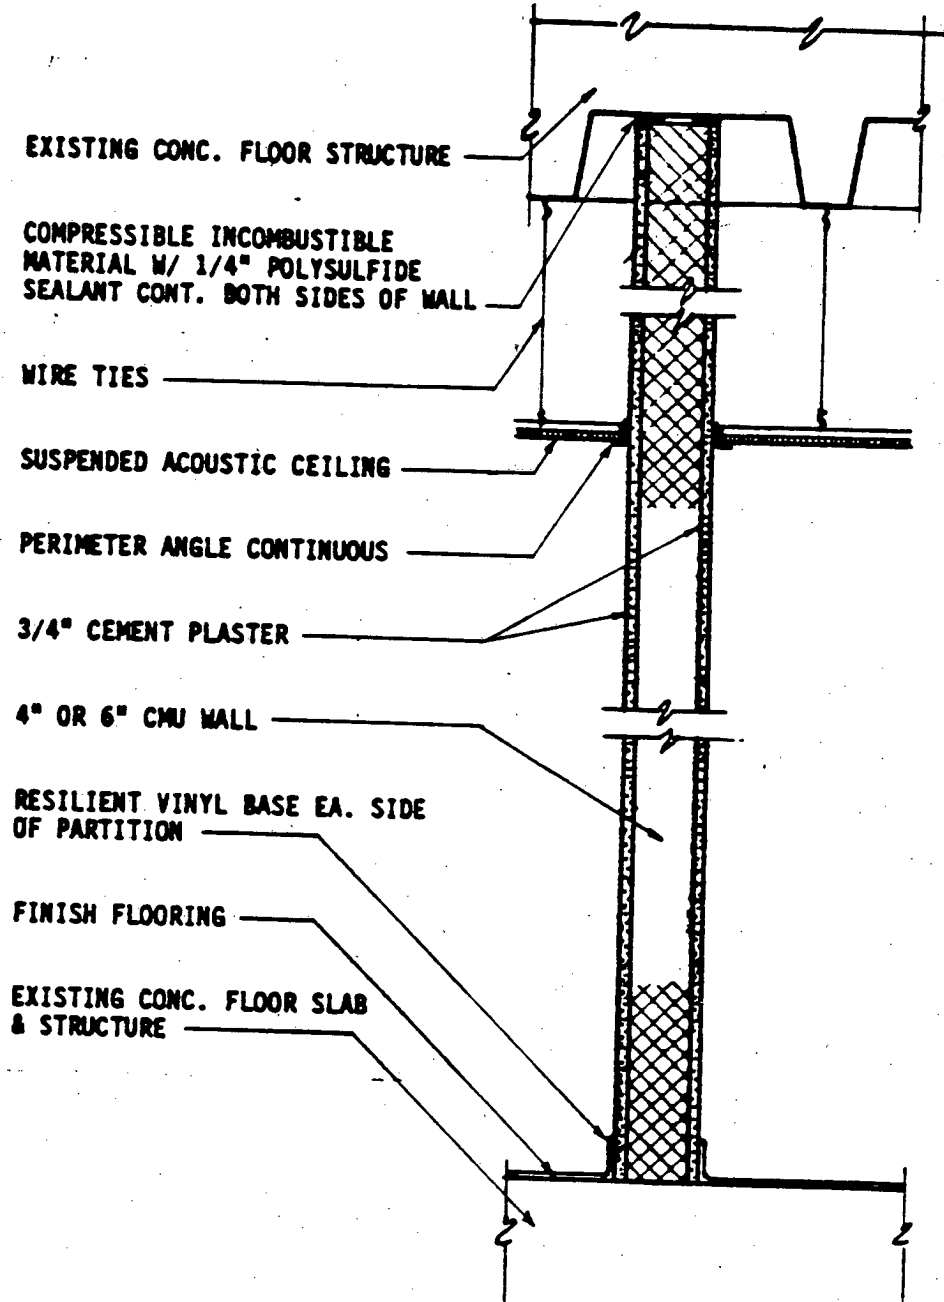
CMU VAULT WALL CROSECTION
